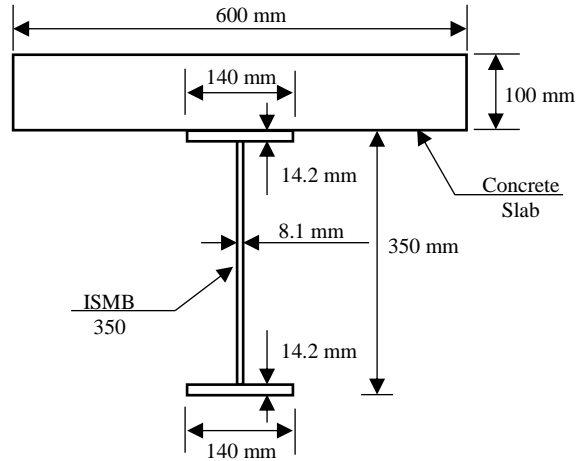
Sectional dimensions of steel-concrete composite girder
